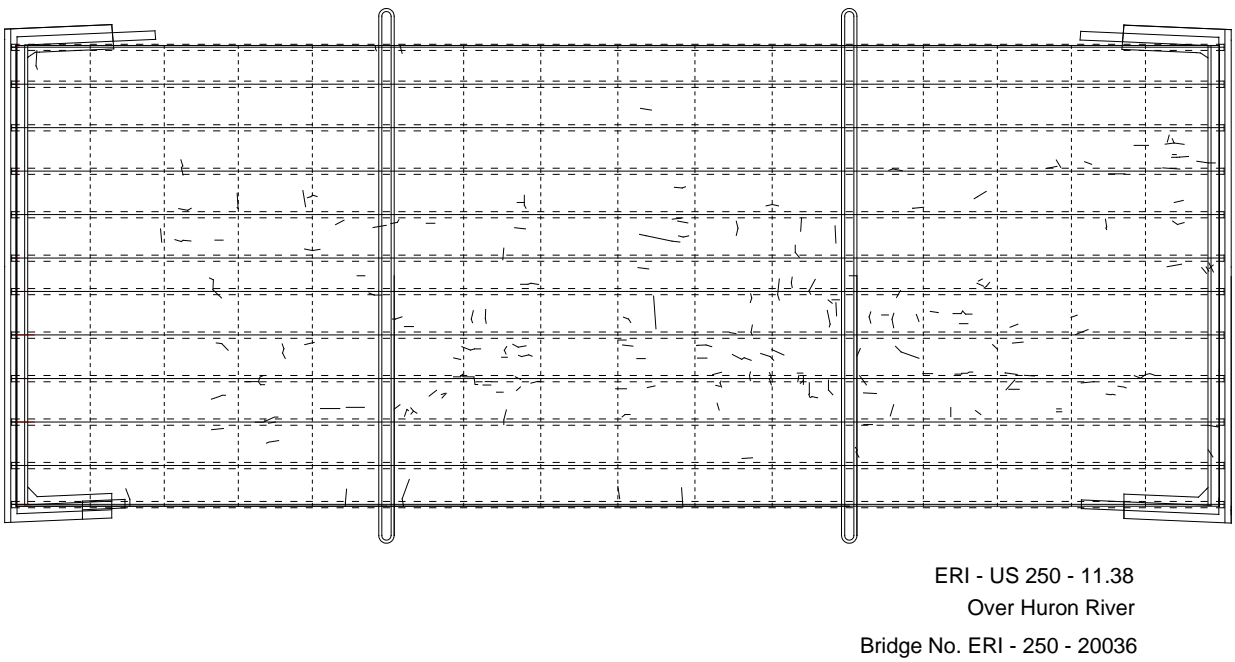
Crack map interposed with structural layout for Bridge Number ERI-250-20036
